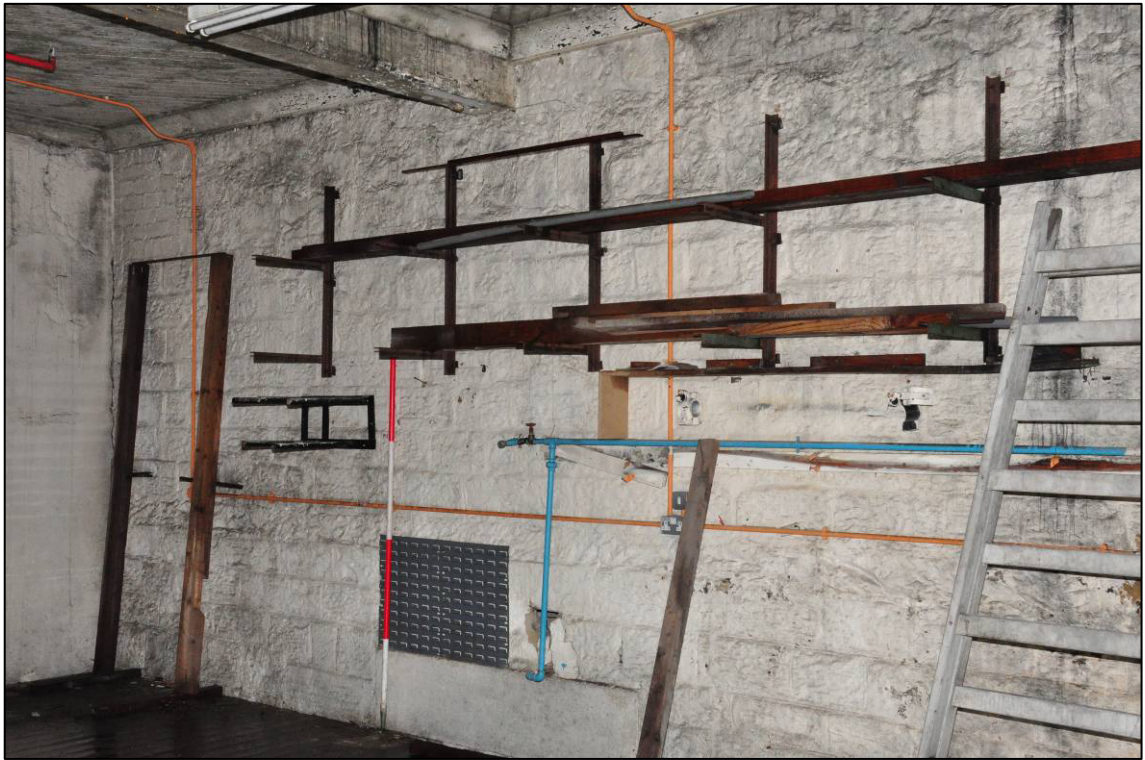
Northern engine house, first floor, east wall, looking NE (photo 11852).
